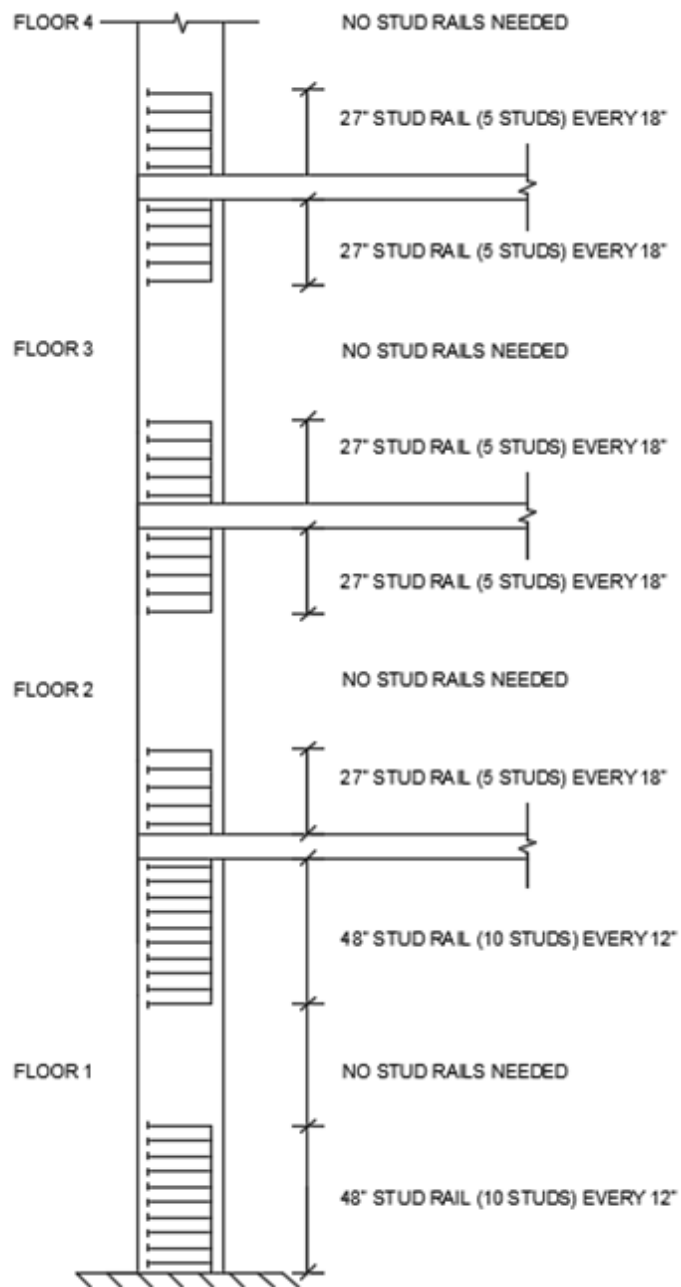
Stud Rail Diagram for the Floor 1 – 4
